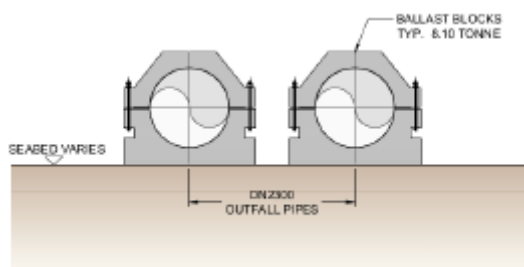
Deep Area of the Pipeline Corridor – Typical Example Cross-Sections with Outfall Pipeline on Seabed
